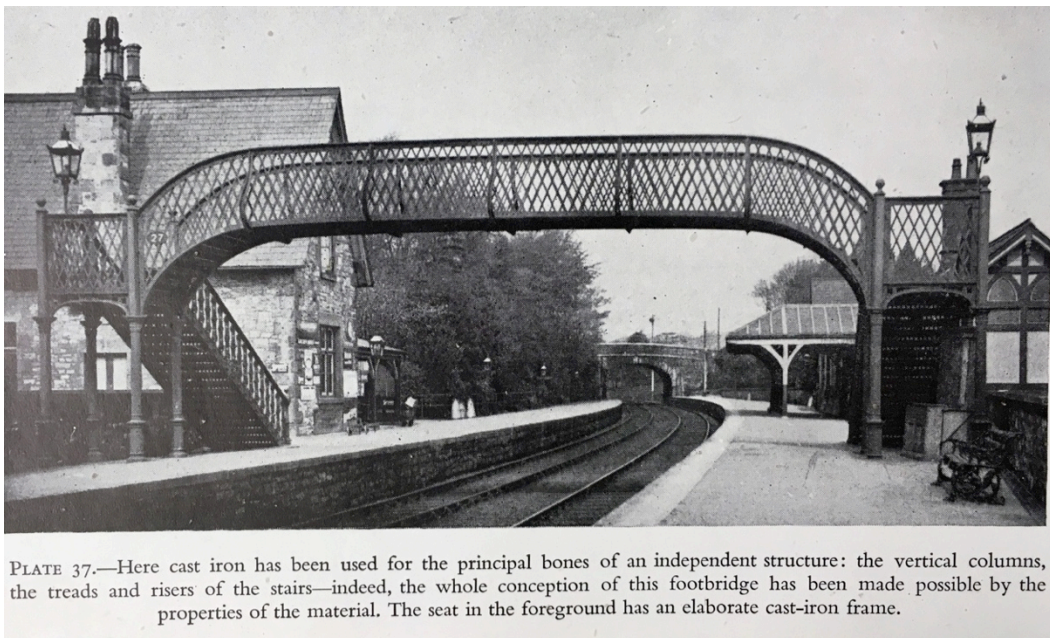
Macfarlane footbridge at Cark Station. Source: R.H. Sheppard, *Cast Iron in Building* (London, 1945), plate 37
